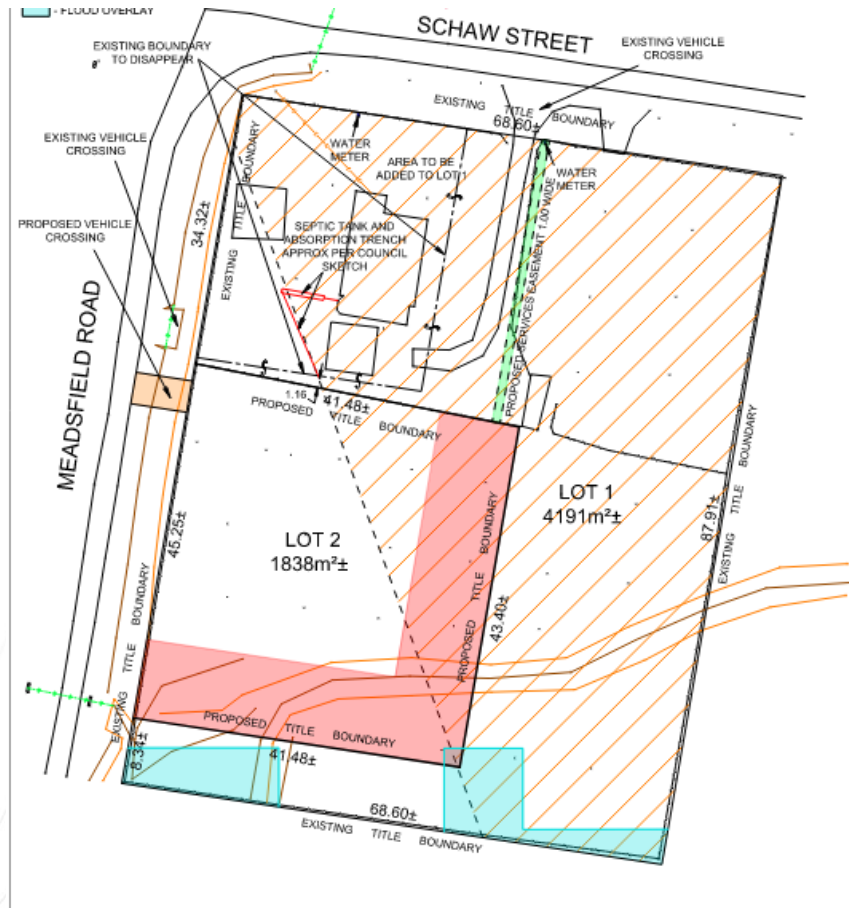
Extract of proposal plan for 2 Lot Boundary Adjustment.
